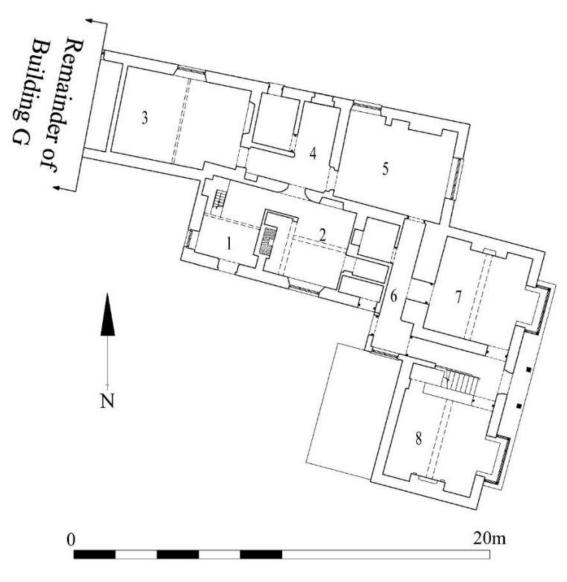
Main House and Buildings H and I ground floor plan Modified from David Granger Architects drawings
